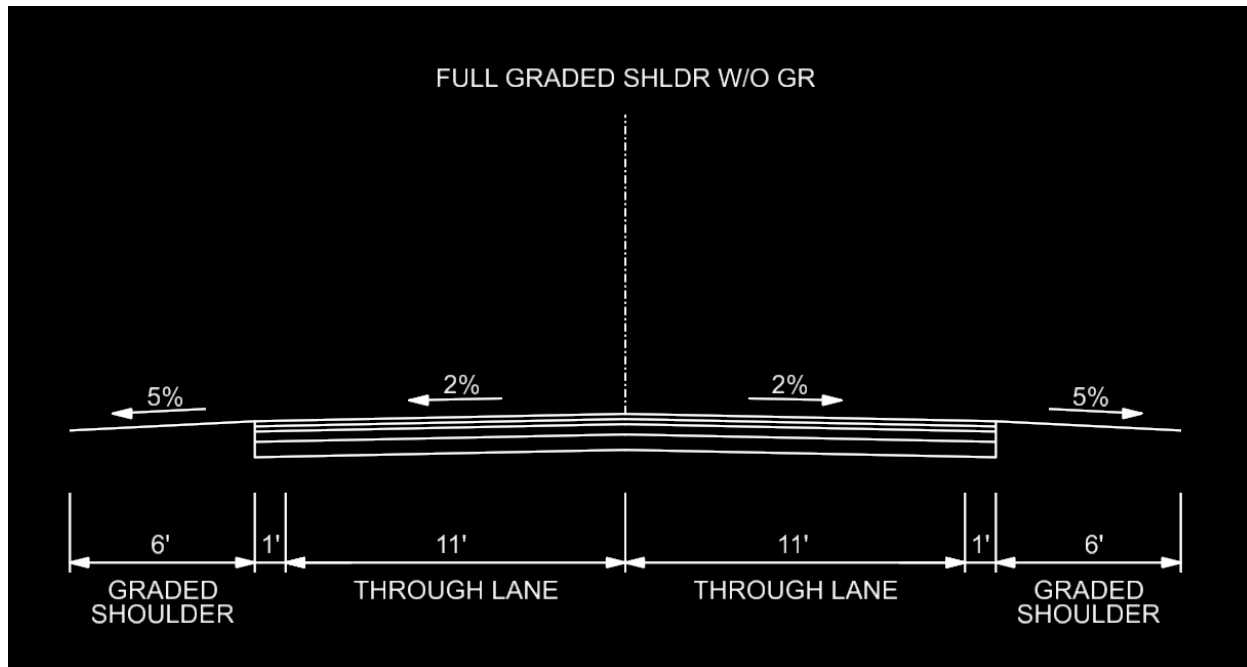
Typical Section of Undivided Two-Lane Rural Collector with Full Graded Shoulder, No Guardrail
